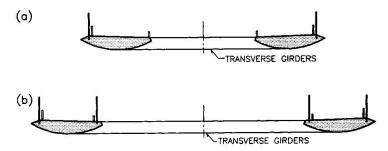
Cross sections of twin box girder decks with two, respectively four cable planes.
